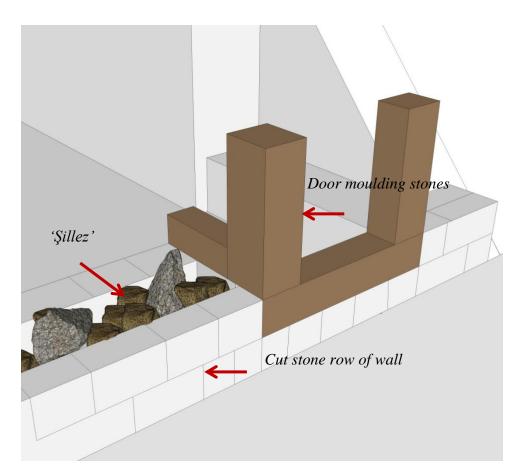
6 Wall section of double sided wall filled with sillez and door formwork
